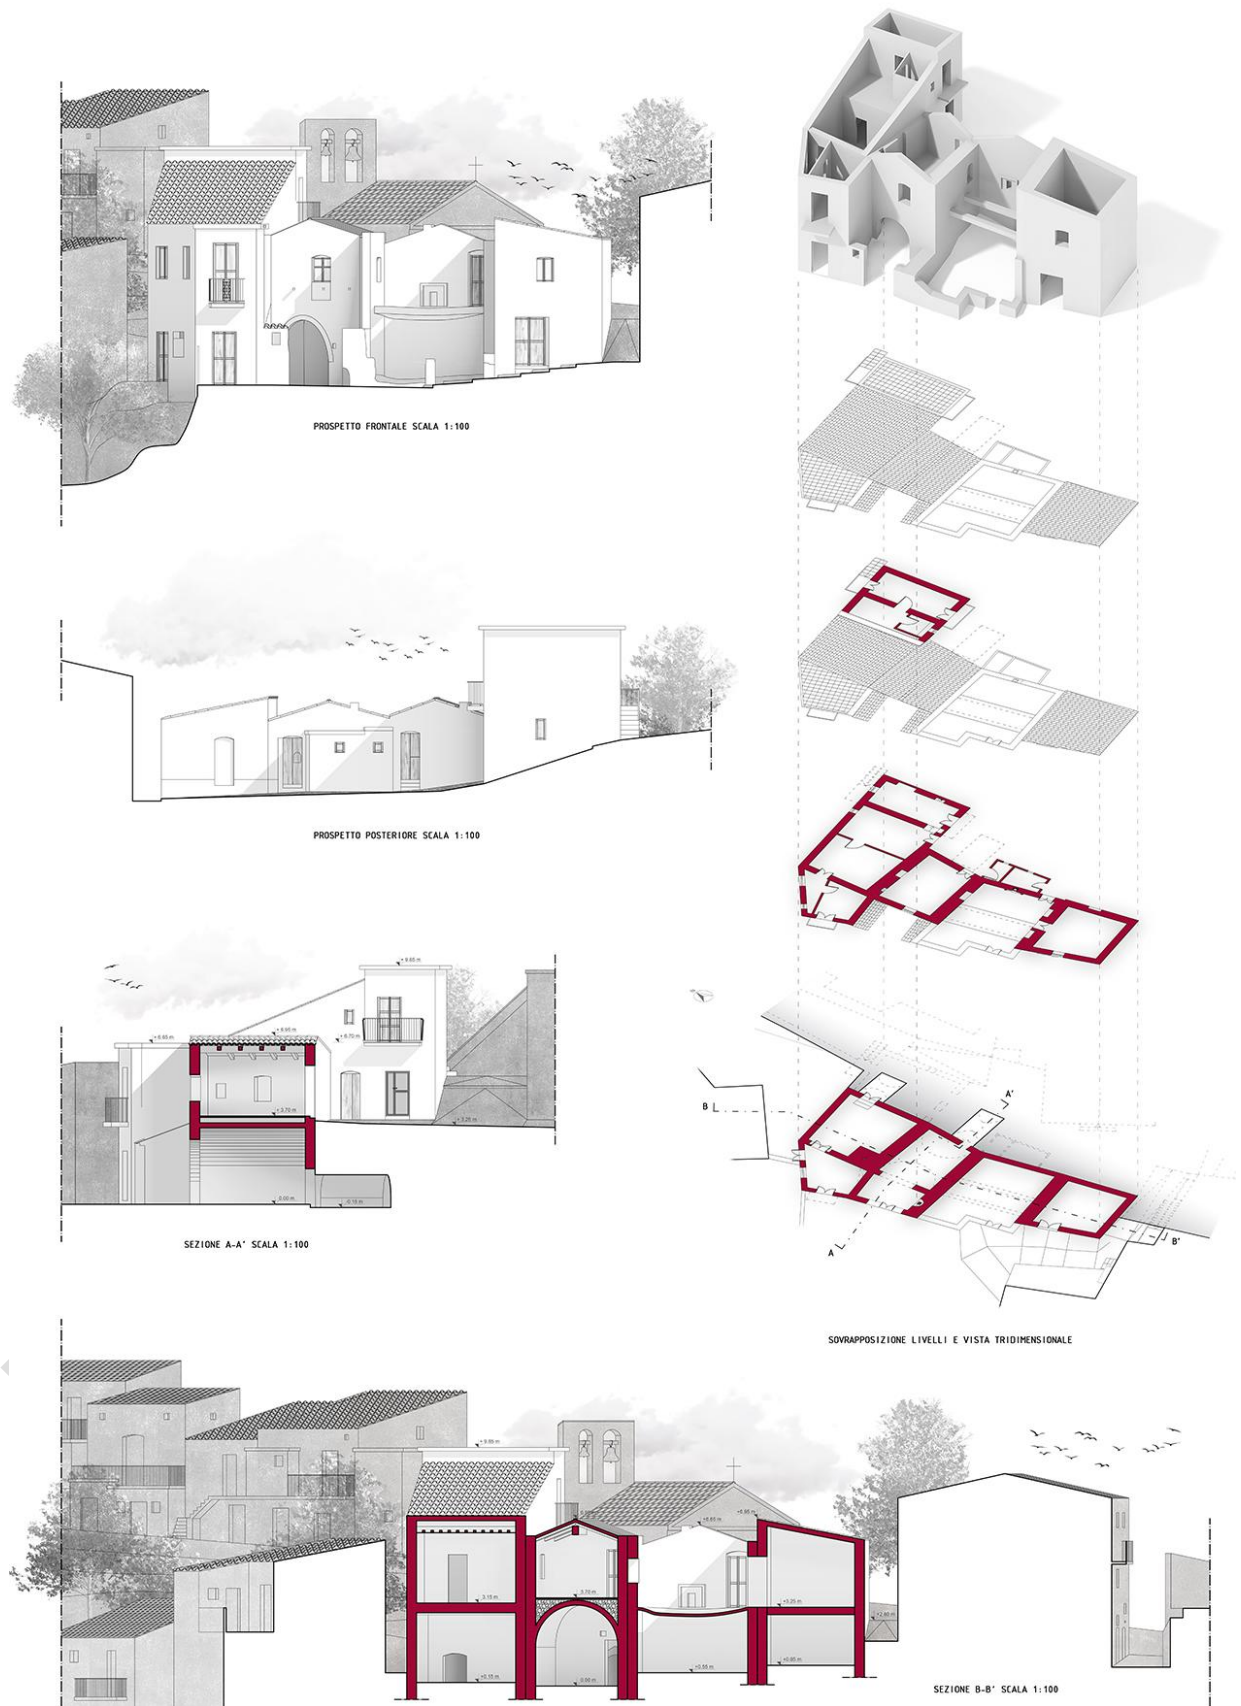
Plans, sections, elevation, and axonometric view of the aggregate 25. © 2024, Authors.
